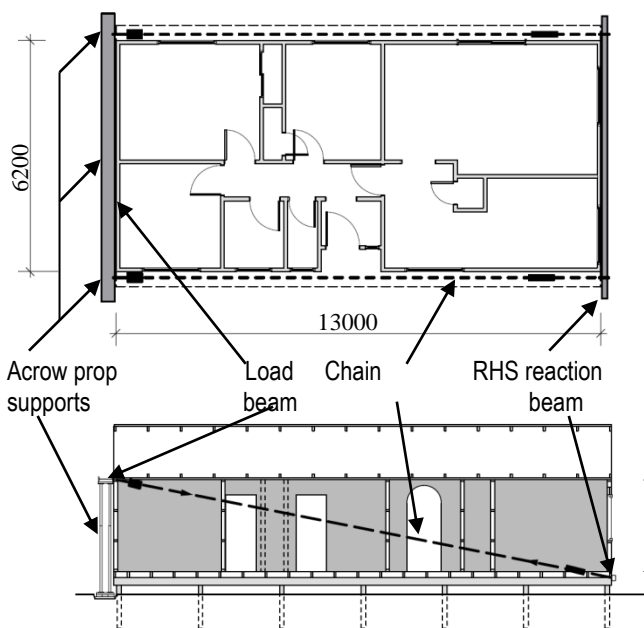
Floor plan and section view of Wairoa St. house showing load system By L Holt
